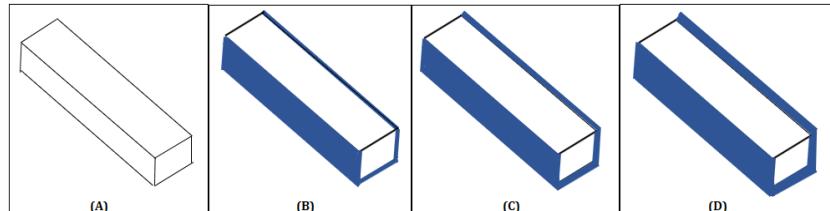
Schematic view of beams (A): Reference beam, (B): 1-layer reinforced beam, (C): 2-layer reinforced beam, and (D): 3-layer reinforced beam.
